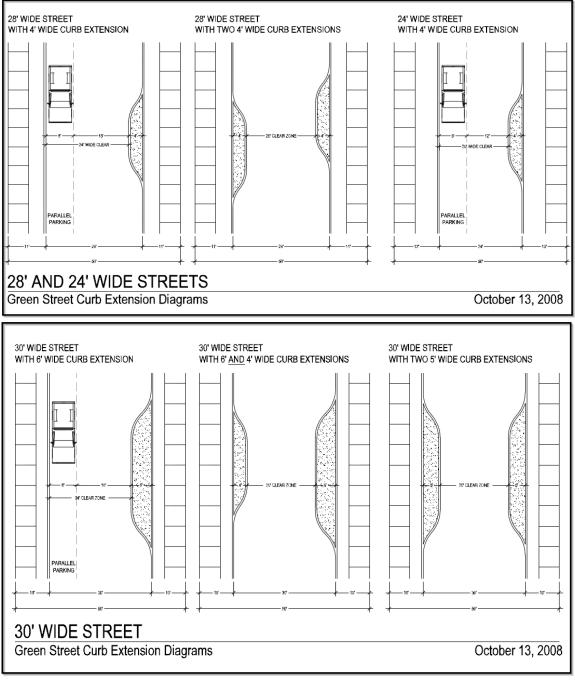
Street Widths for Curb Extensions, Residential Streets
